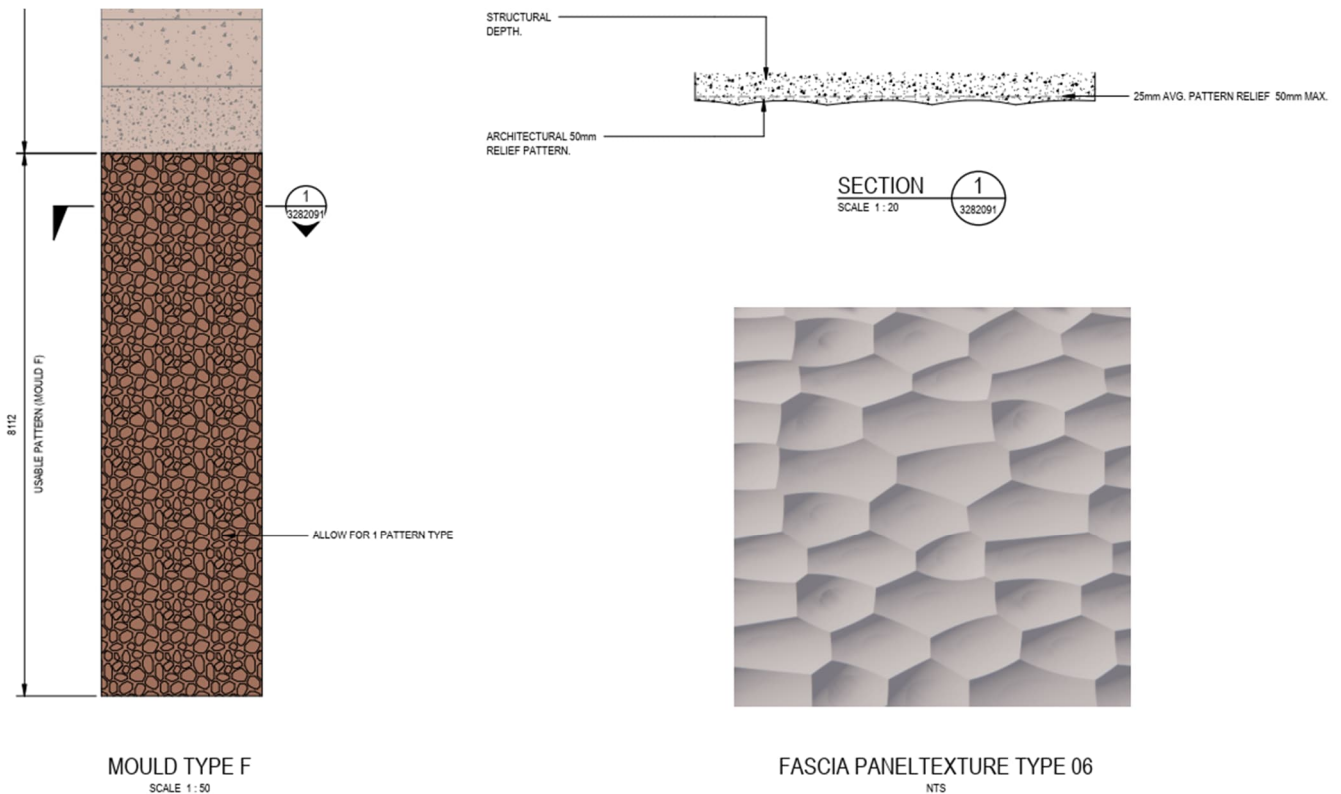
Fascia Panel detail of the approach to the Bridge 03 Northern Abutment
